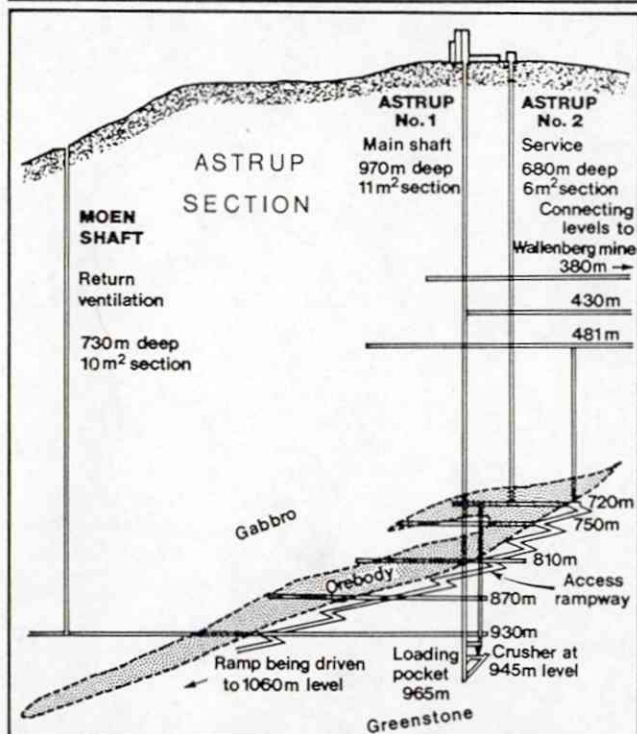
(left): Details of the Astrup Section shafts and access rampway.
